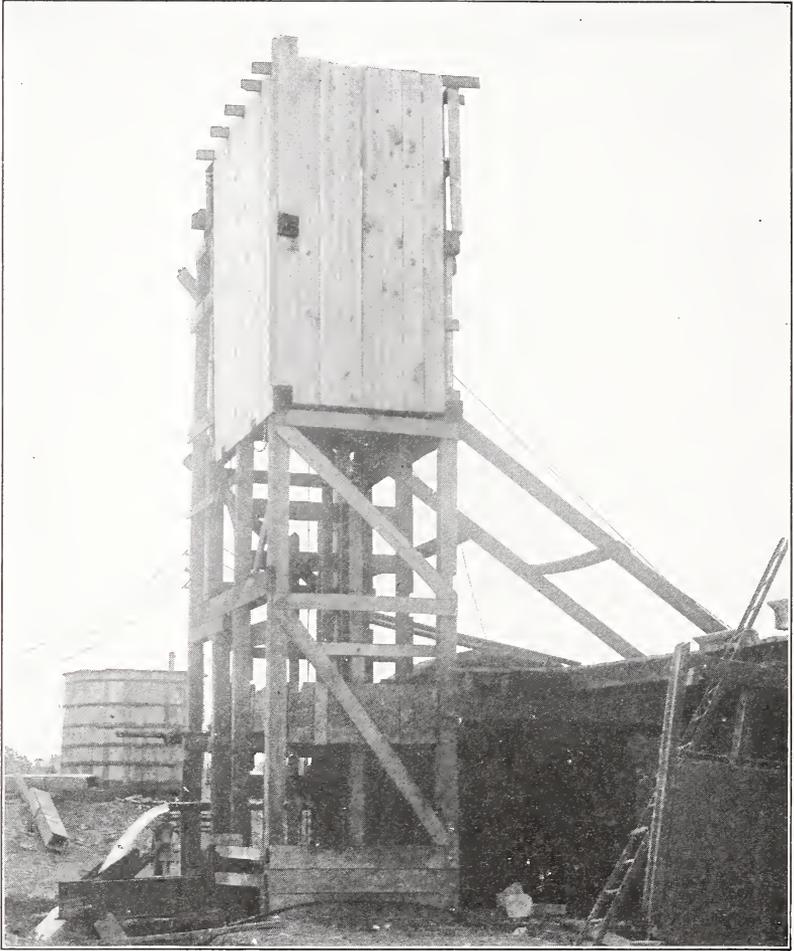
Tippie and mine shaft, Centerville Gypsum Co., Centerville, Iowa
